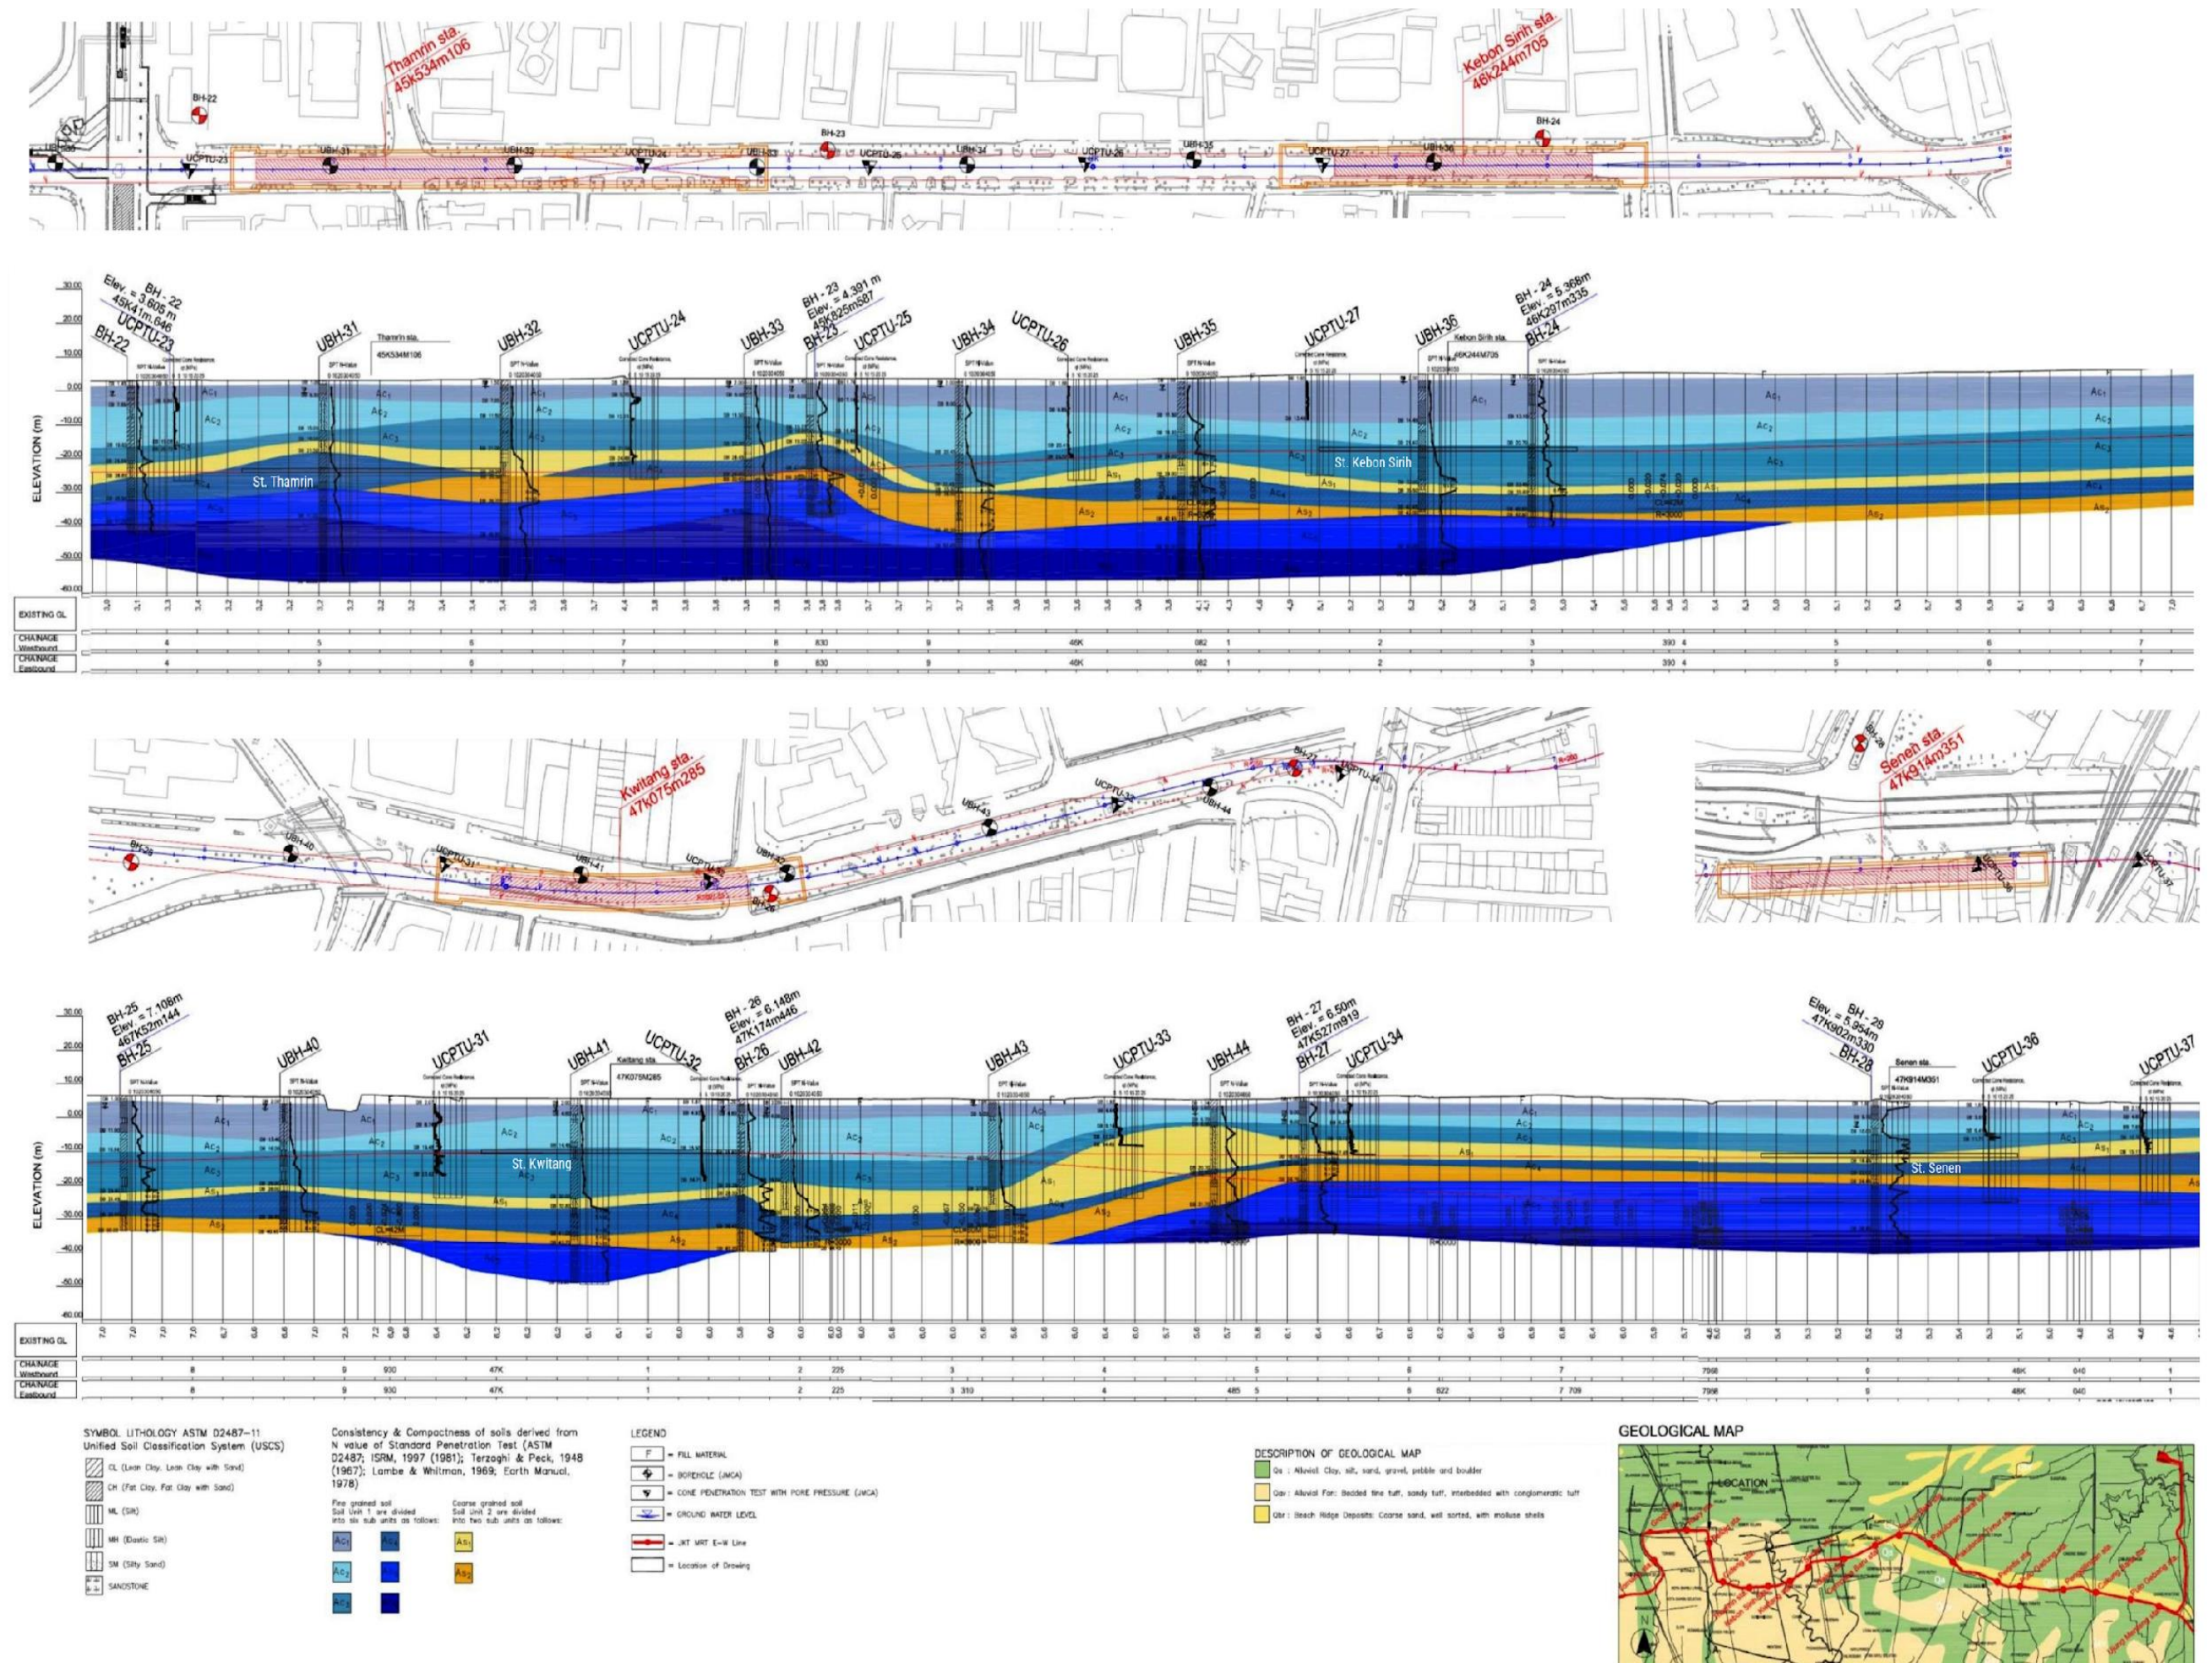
Tunnel Excavation Path Plan for Geotechnical Soil Profile of St. Thamrin to St. Senen
